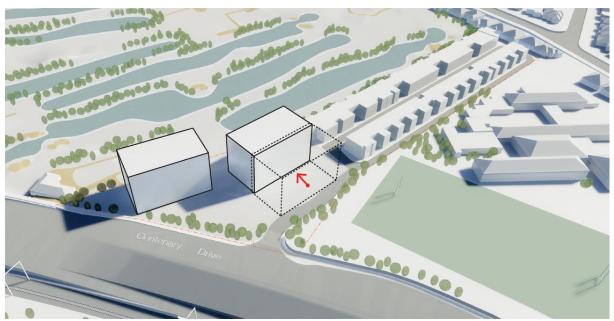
Pushing building forms north to reduce impacts on the adjoining school
